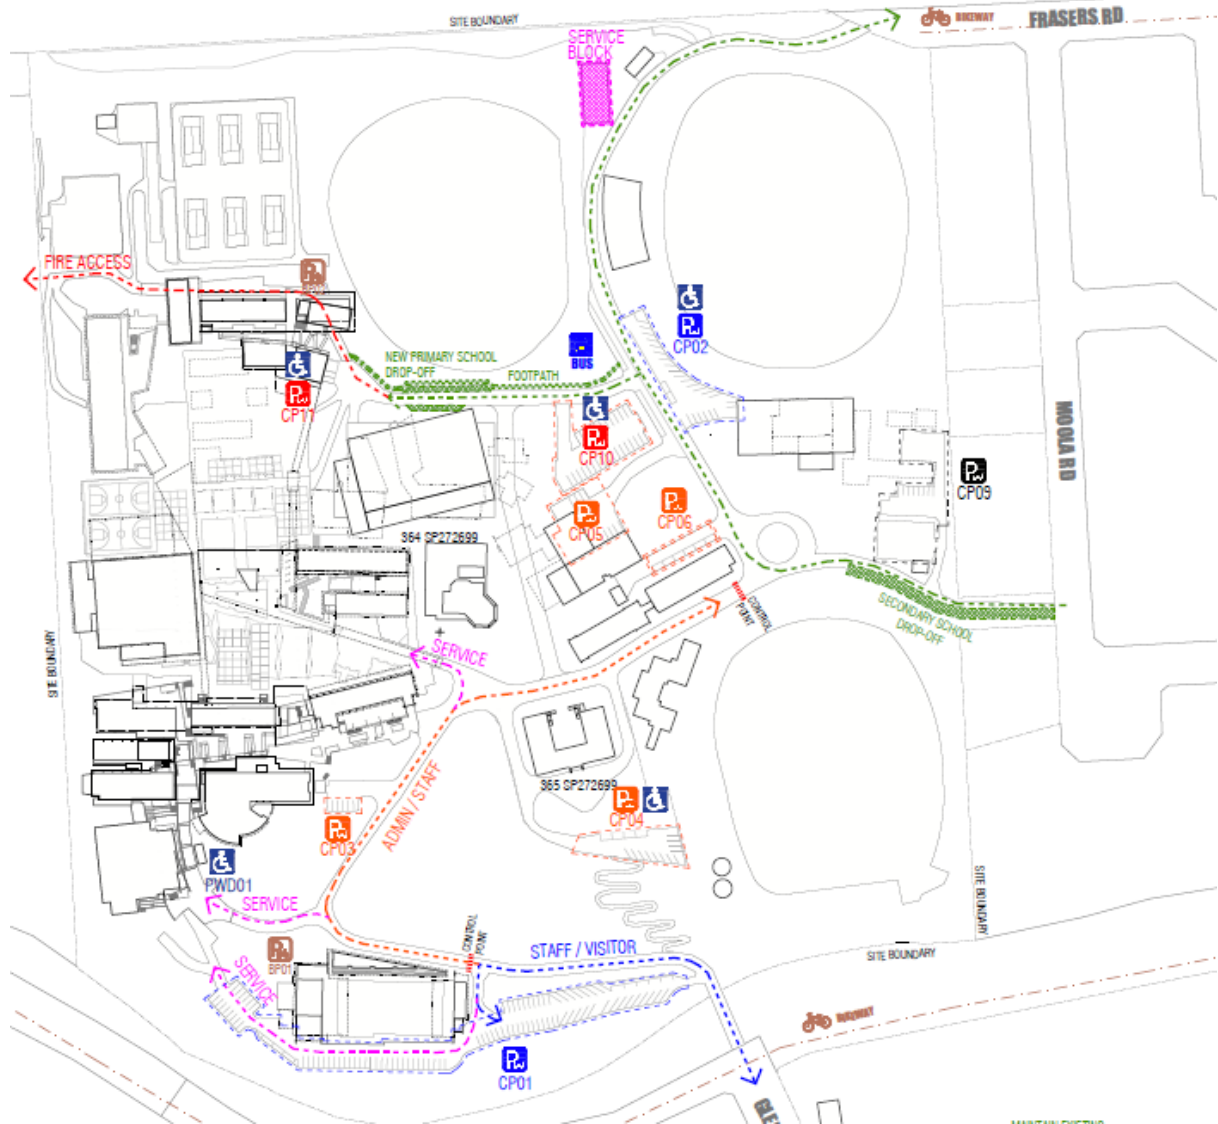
Proposed Vehicular Routes and Car parking within the College.
